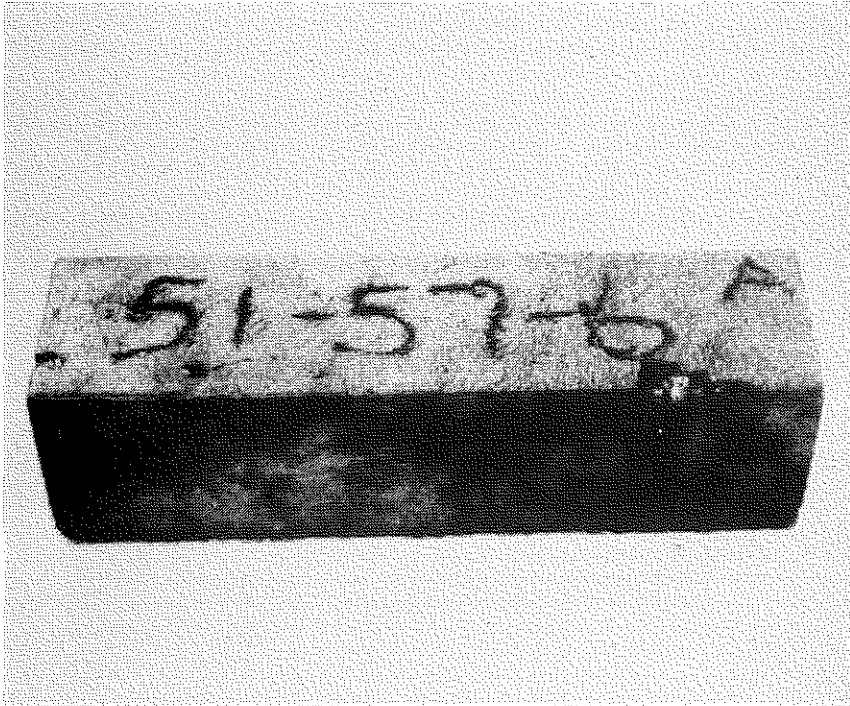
Cracking of Concrete Prism Associated with Freeze-Thaw Damage.
